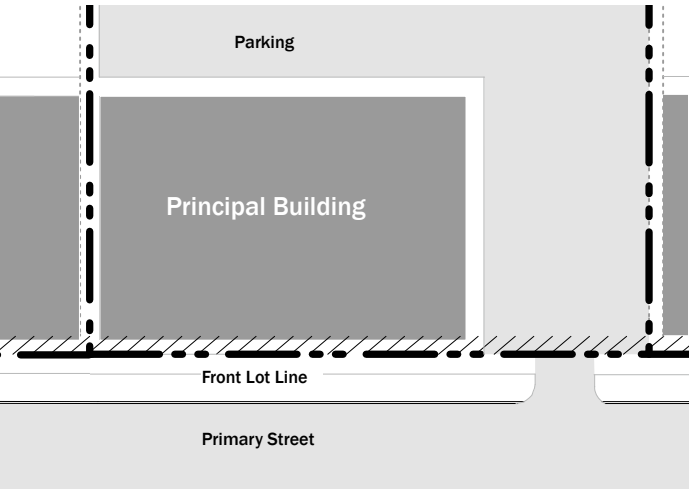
G (3). Primary Street Frontage Only: Access Drive Permitted Location
